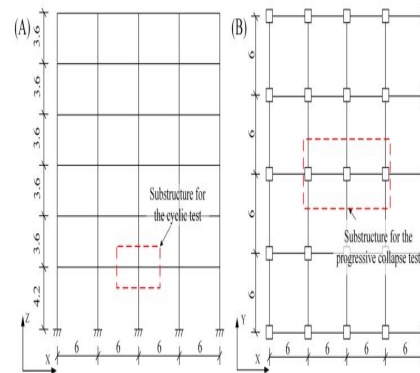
Elevation view (A) and plan view (B) of the six-story RC frame (unit: m) [Color figure can be viewed at www.wileyonlinelibrary.com]
